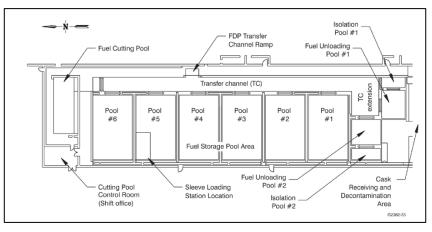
Plan view of CPP-666 Fuel Storage Area.
